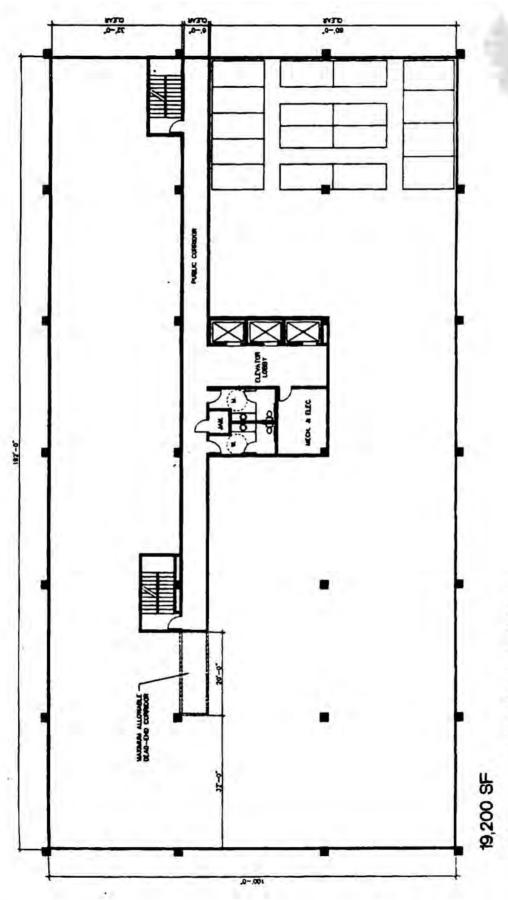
, Floor plan, building shell. (Design: Jain Malkin Inc.)
